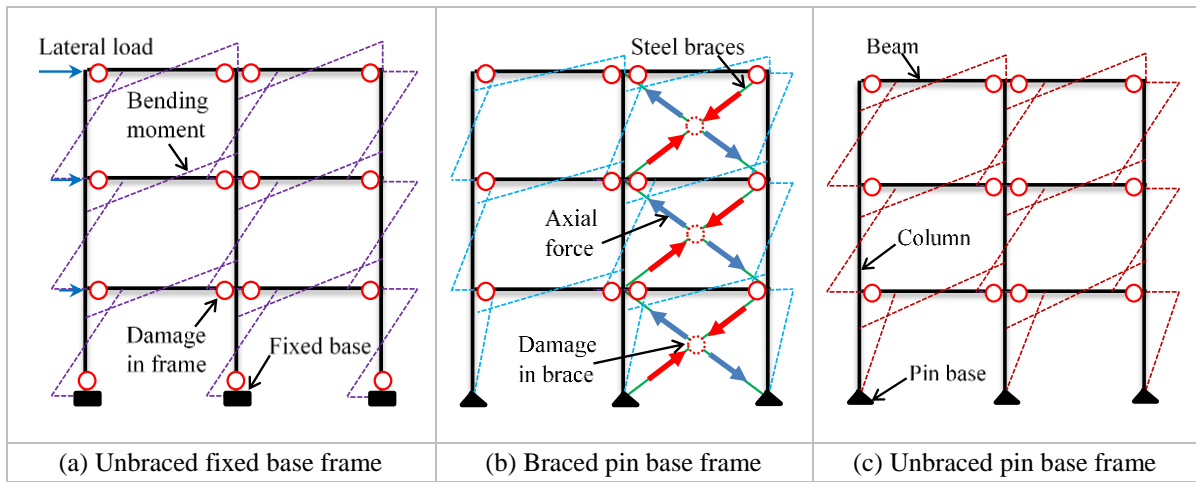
Lateral load resisting frame options within the proposed demountable building system
